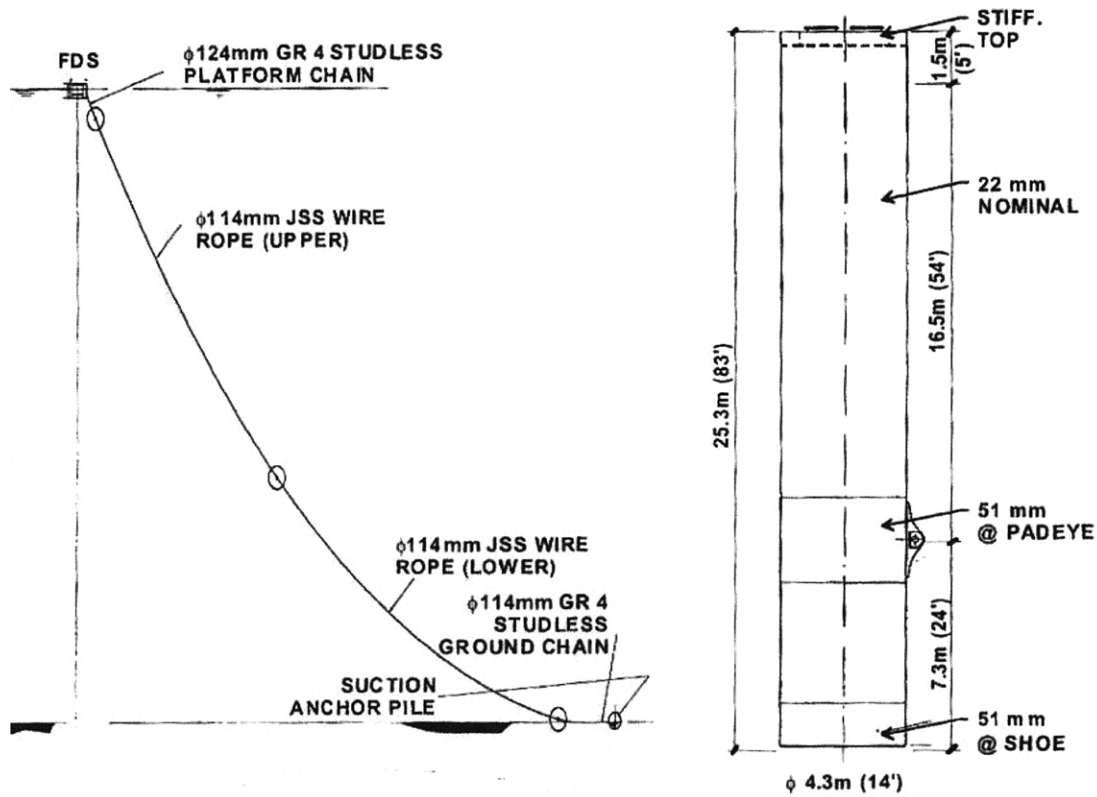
Na Kika FDS mooring elevation and suction pile configuration (Source: Newlin, 2003)
